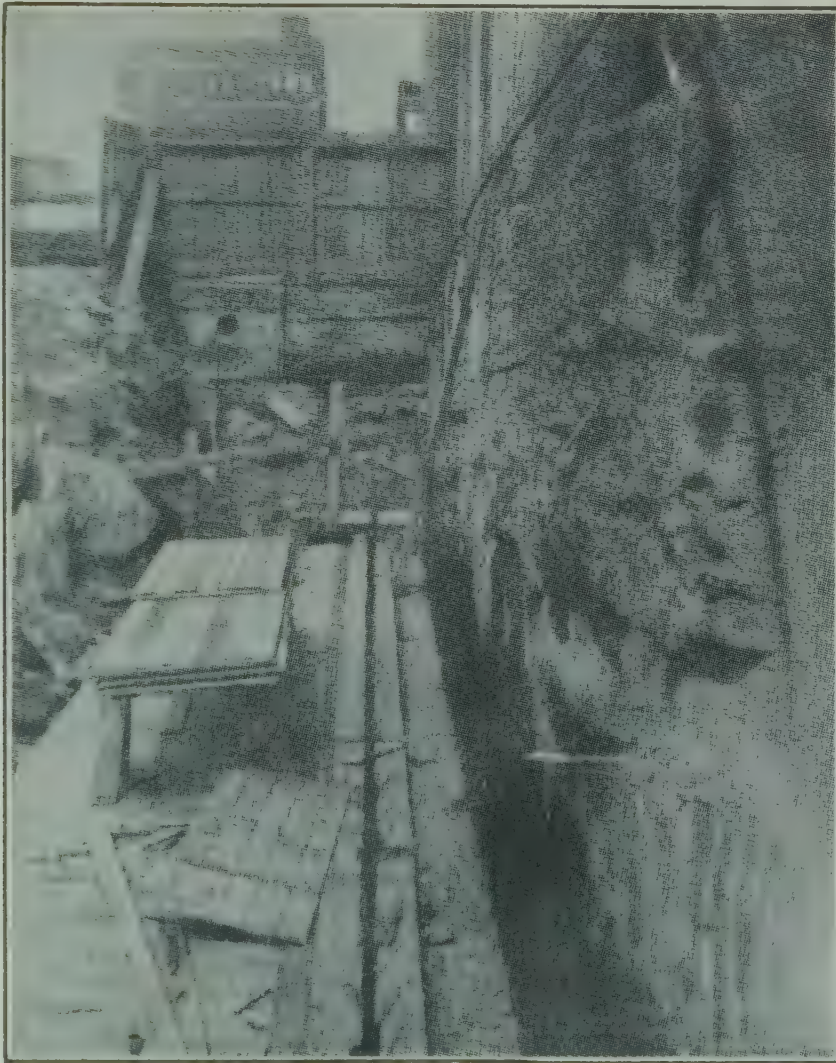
Footing of reversed L-shaped retaining wall, New York approach to Lincoln Tunnel.
